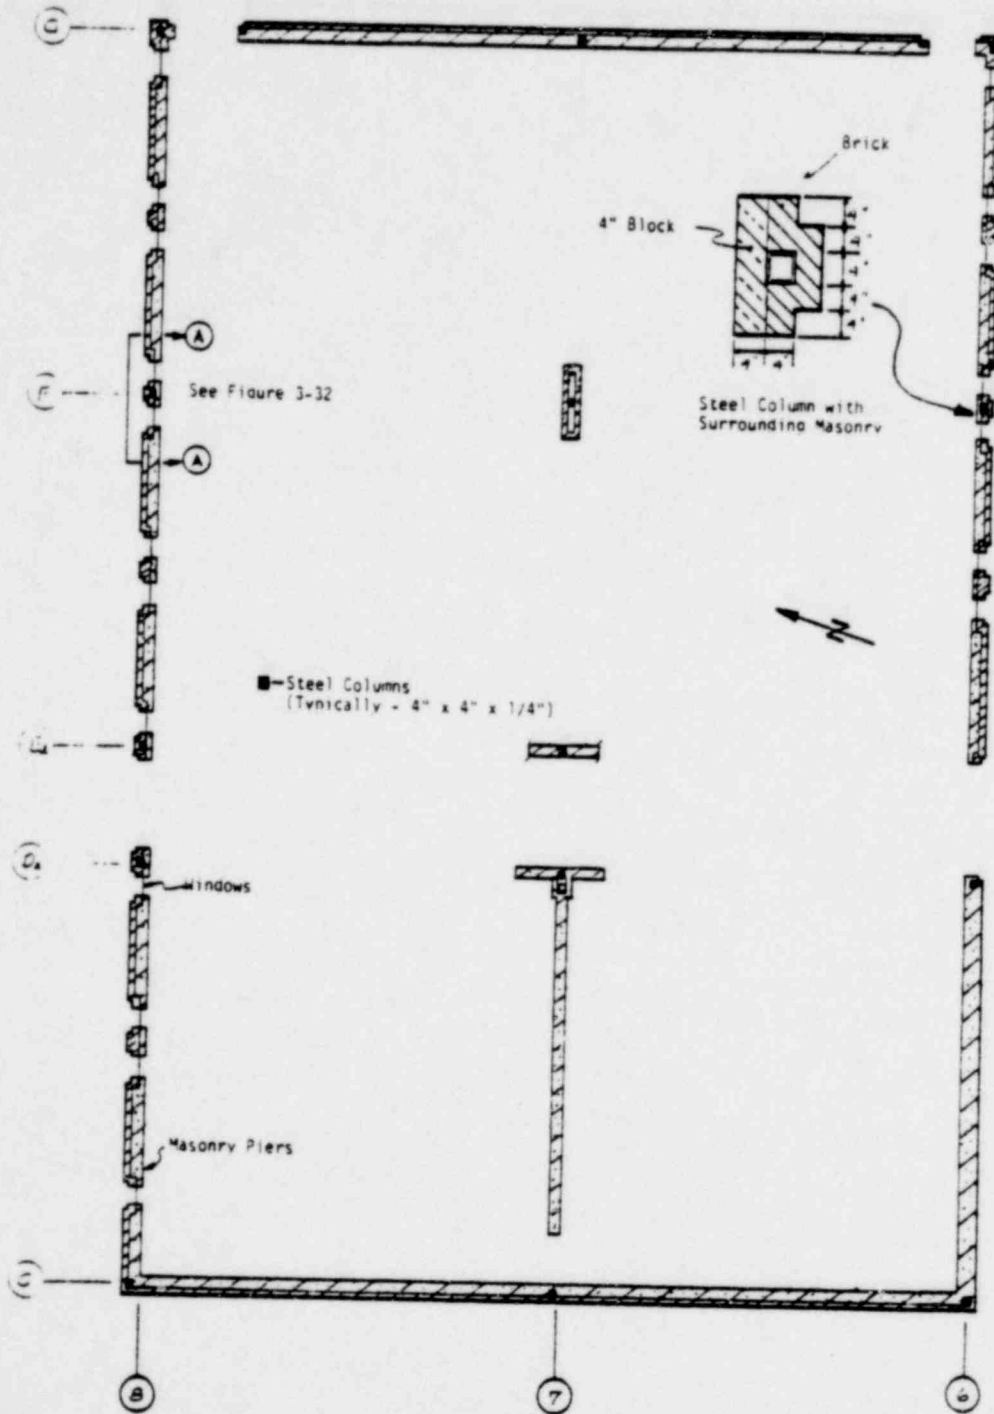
PLAN OF JN-4 MAIN LABORATORY
